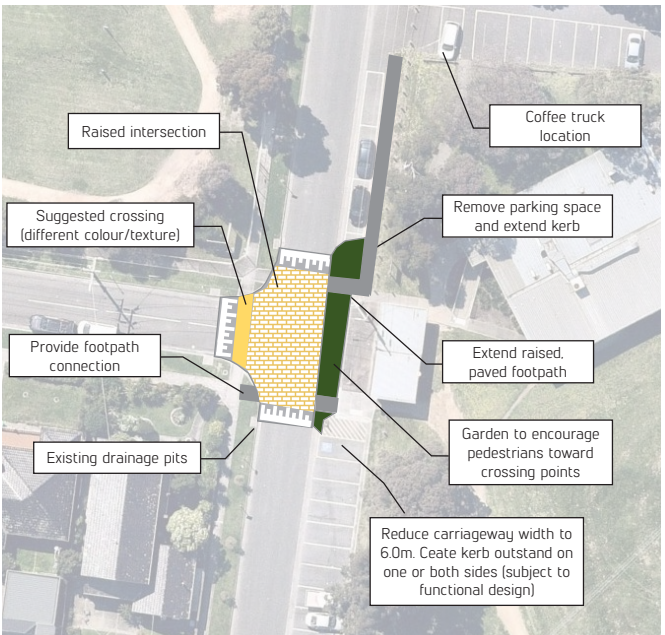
Boronia Street / Cedar Street raised intersection (SALT 3, 2022)
